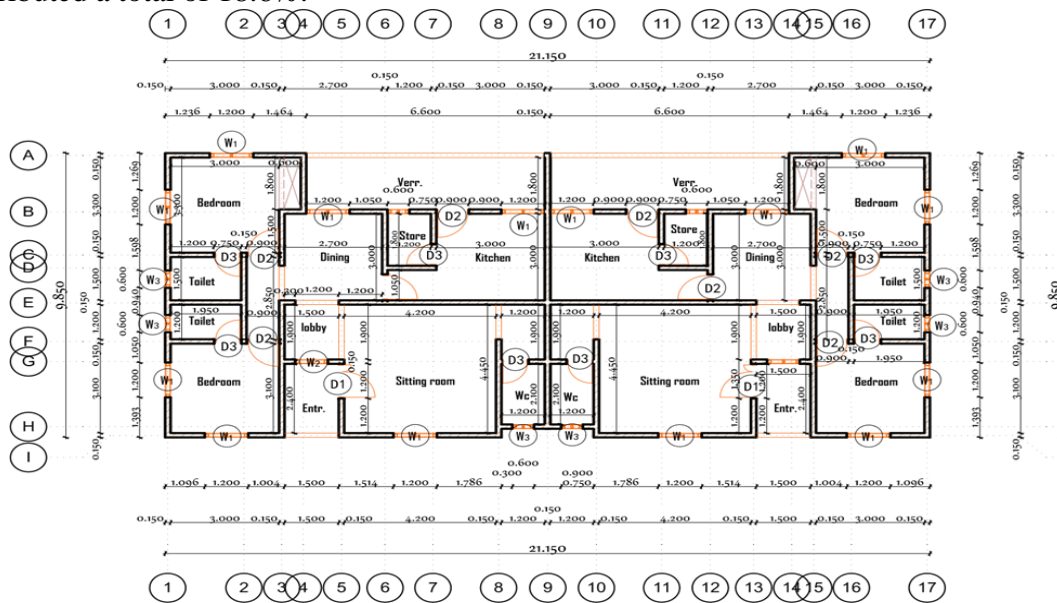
Ground Floor Plan Two Bedrooms apartment building Sakamori Estate, Abakaliki.
